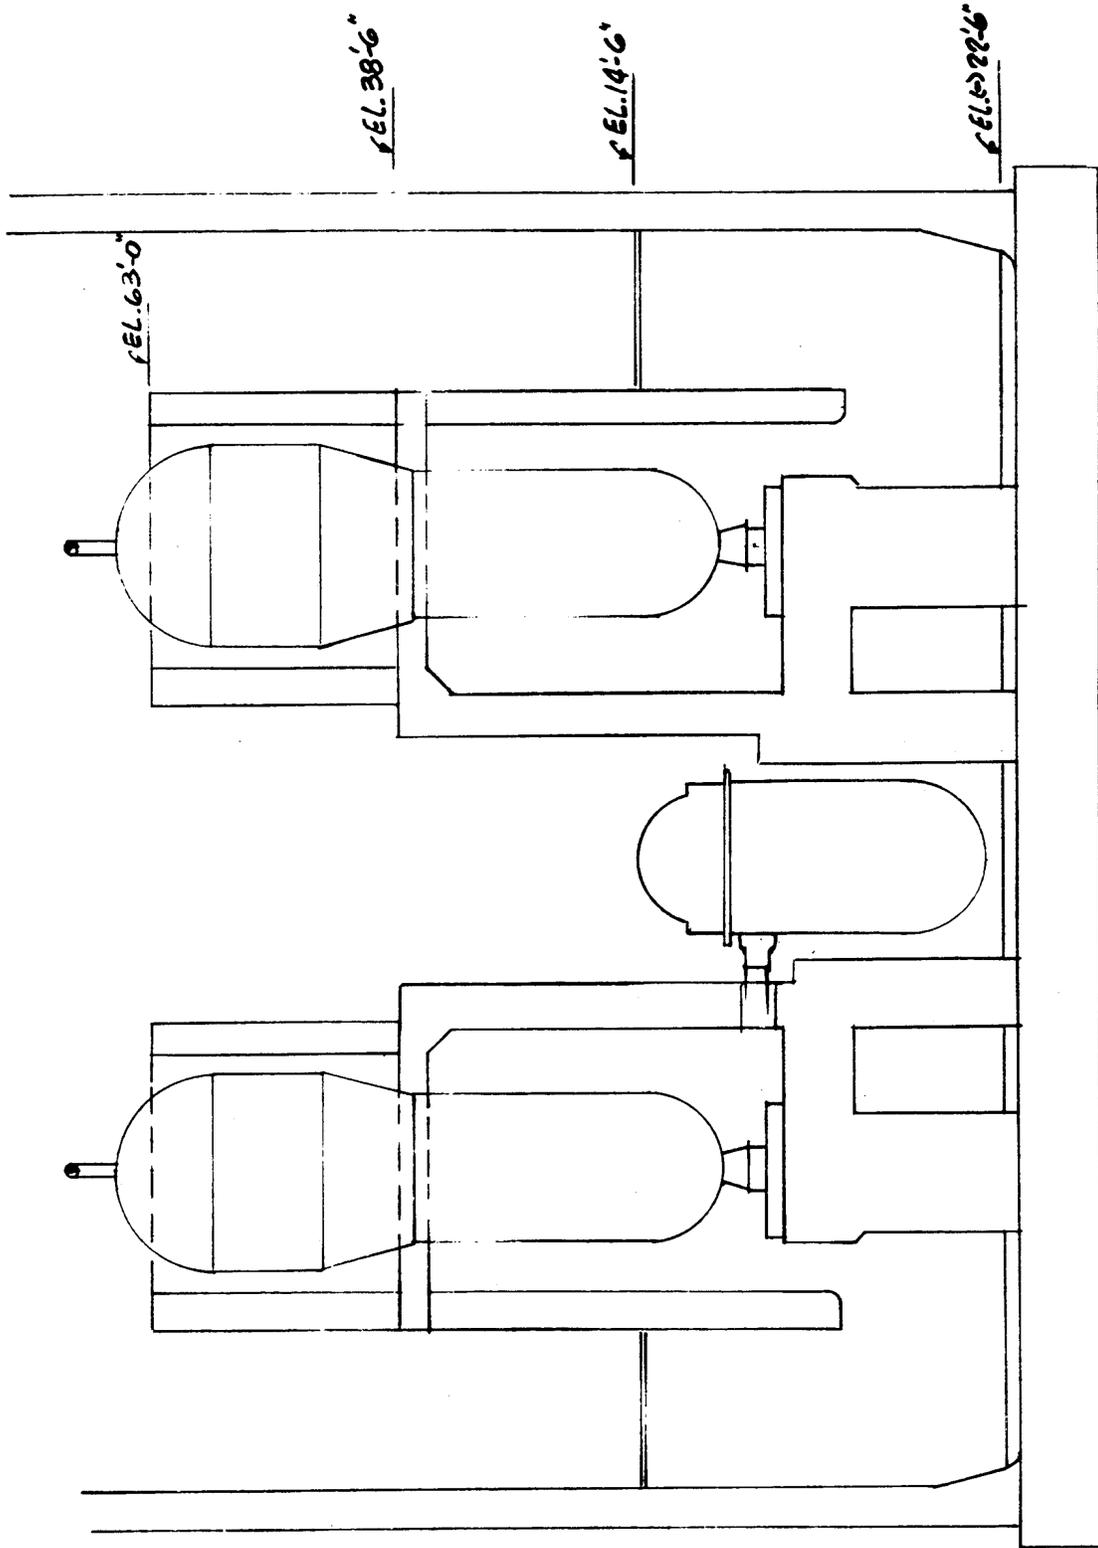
CONTAINMENT STRUCTURE ELEVATION 152 FEET 6 INCHES
